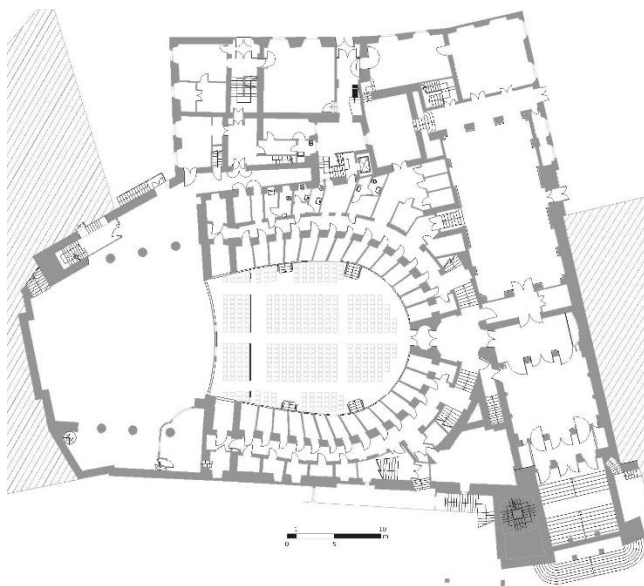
Plan layout of the Teatro Grande of Brescia.
